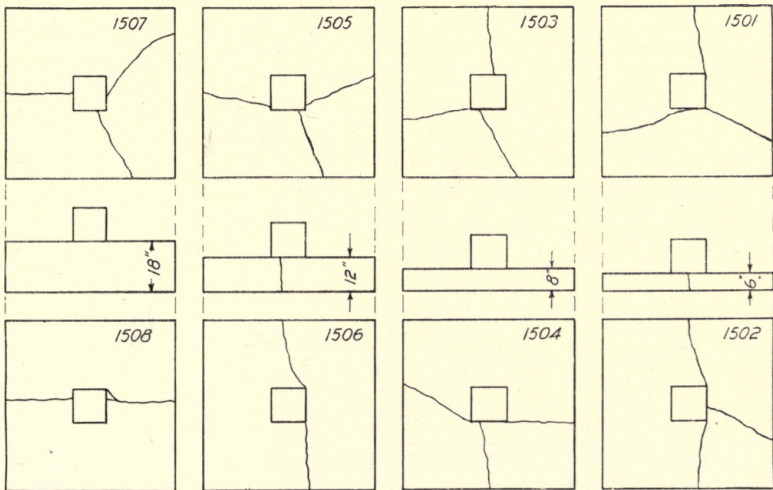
UNREINFORCED CONCRETE COLUMN FOOTINGS.
